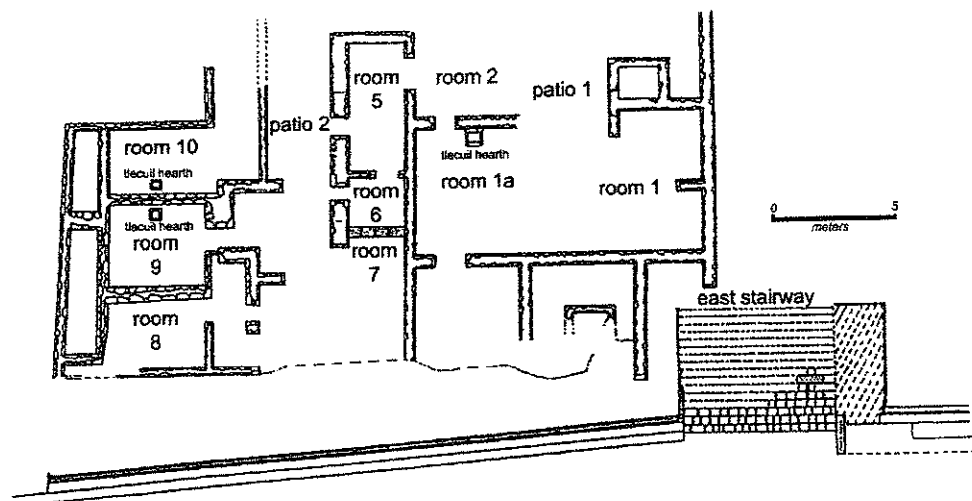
Palace plan, Chimalhuacan Atenco. Excavation revealed wall bases in the building's south-east quadrant. Note *tlacuil*-hearths in rooms 1a, 9, and 10 and the east stairway (lower right). Redrawn from Raúl García et al. (1998: fig. 1).
